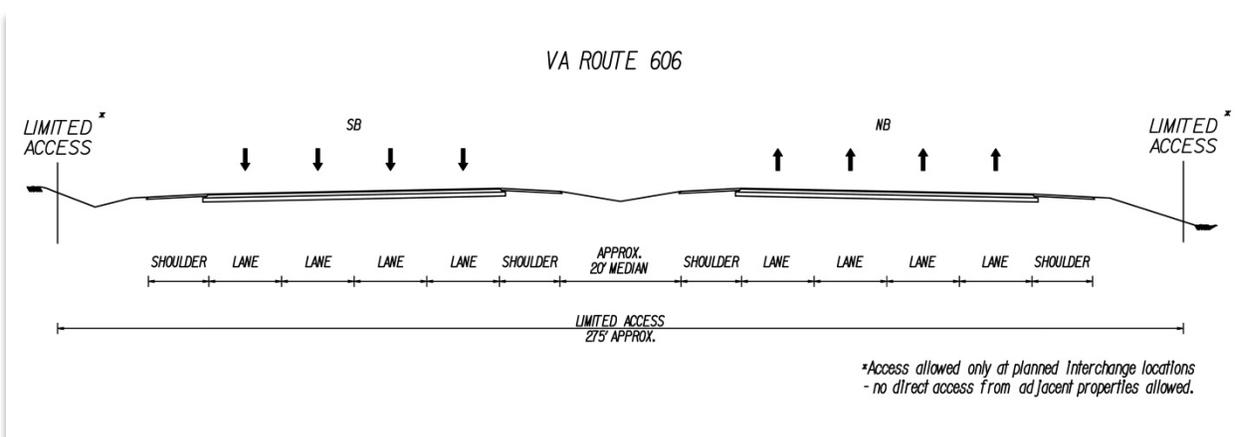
Alternative 3B Typical Roadway Section (VA Route 606)
